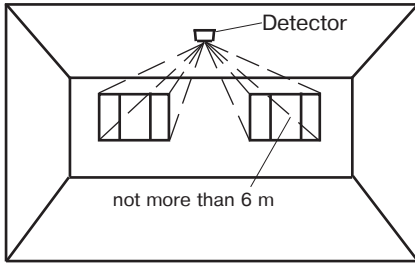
Ceiling mounting (for monitoring of window openings in nearby walls)
